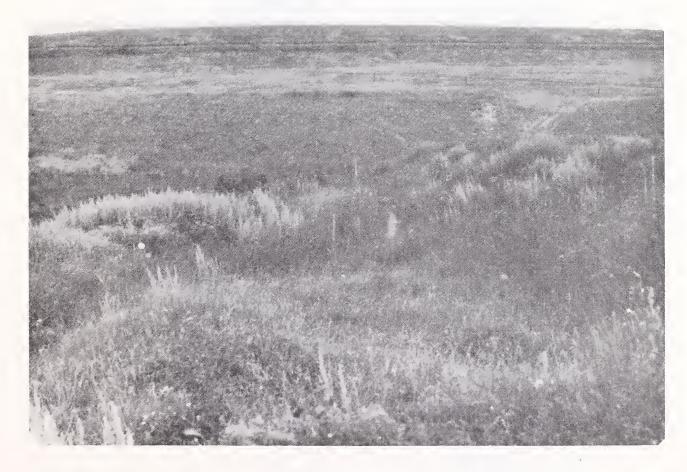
Added Bench on Downstream Face with Irrigation Ditch.
